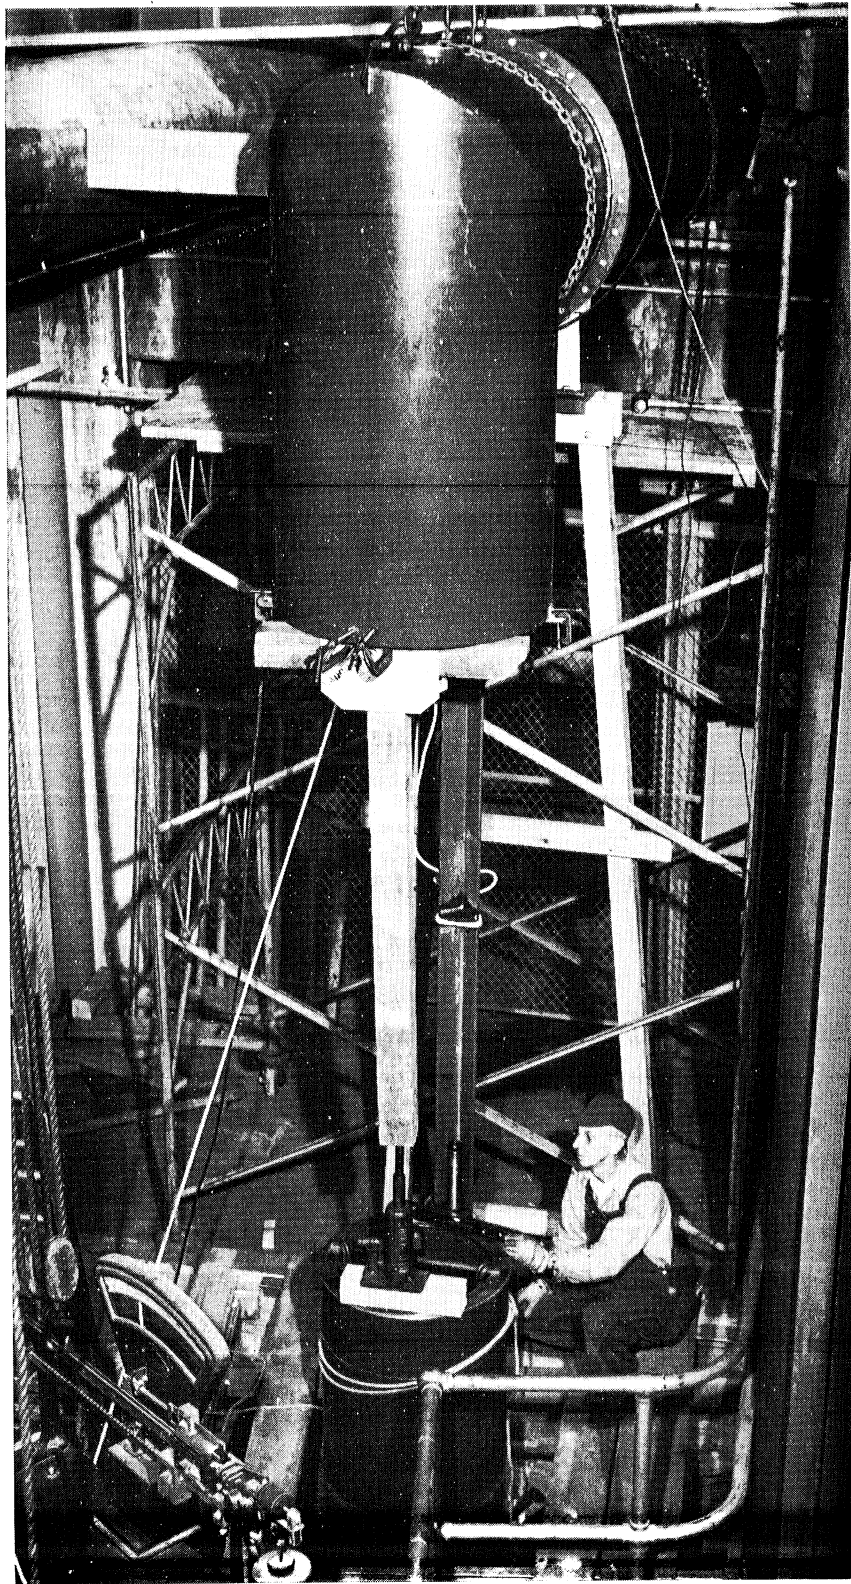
Installation of the Tunnel Inlet Conduit and Miter Elbow
